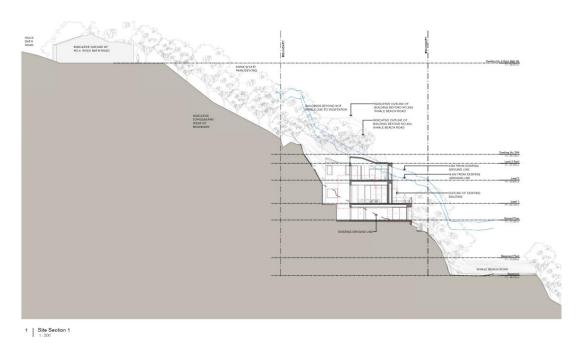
Section of proposed development in relation to landscape features, looking north, extracted from Site Section & Site Elevation (Source: Drawing No. 0200, Rev. A)
